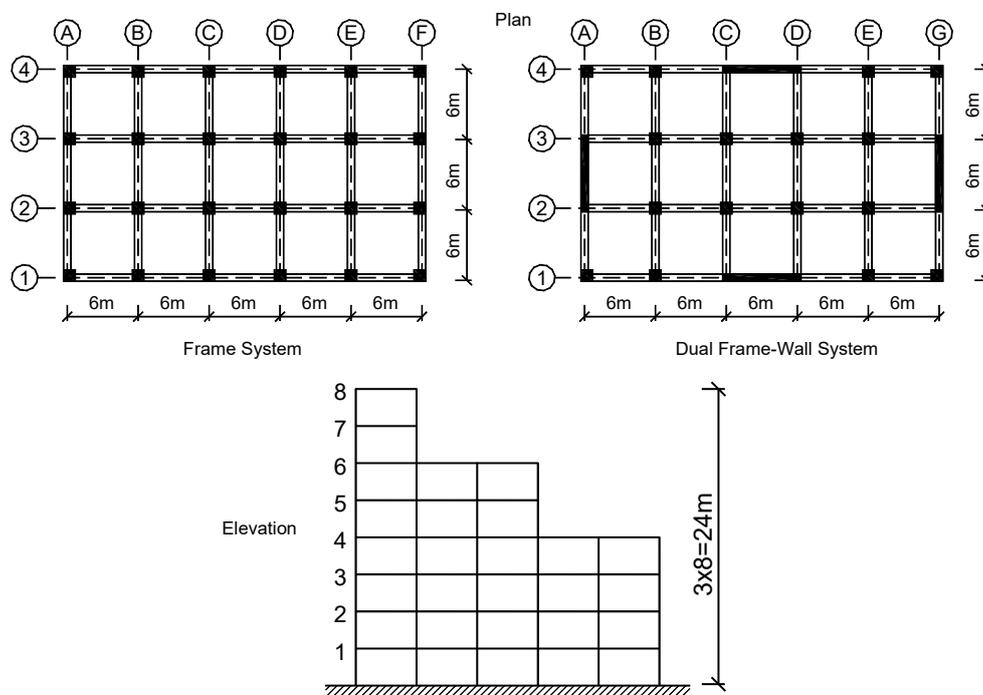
Schematic floor plan and elevation of a typical set-back building
